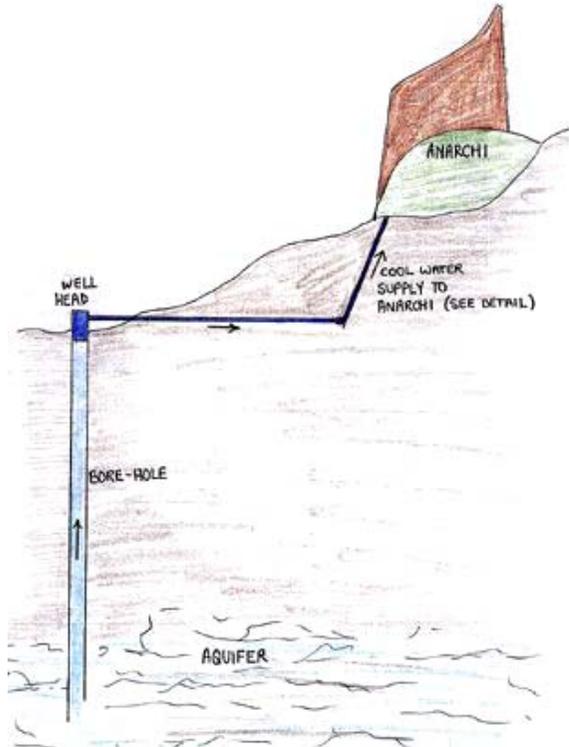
Cross-section through Artesian well, showing supply route to building
